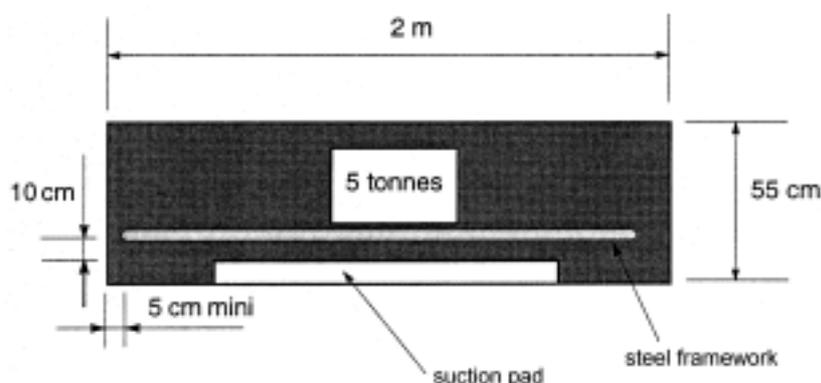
Example of dimensions to be given to a dead weight of 5 tonnes.
